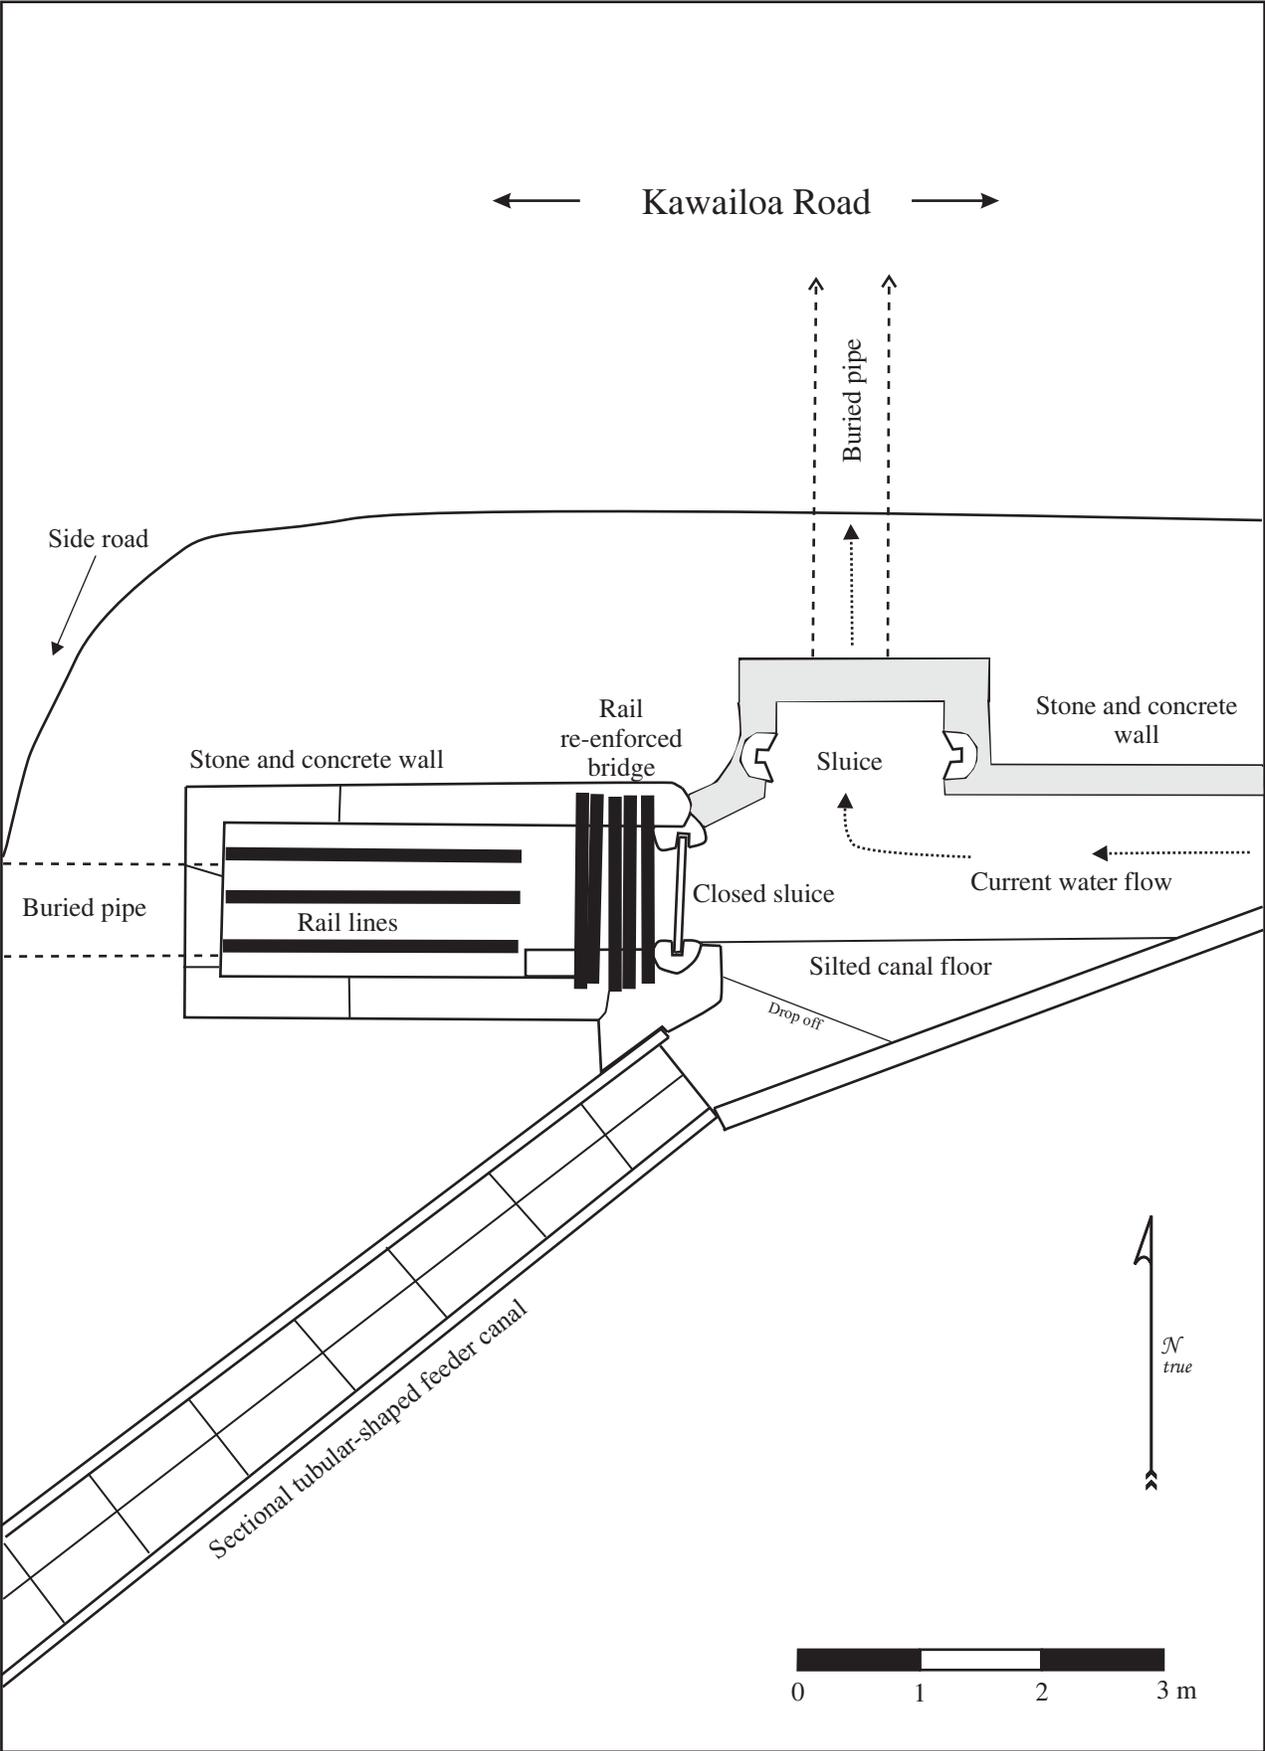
Site 7159 Section 7 terminal sluice gate complex plan view.
